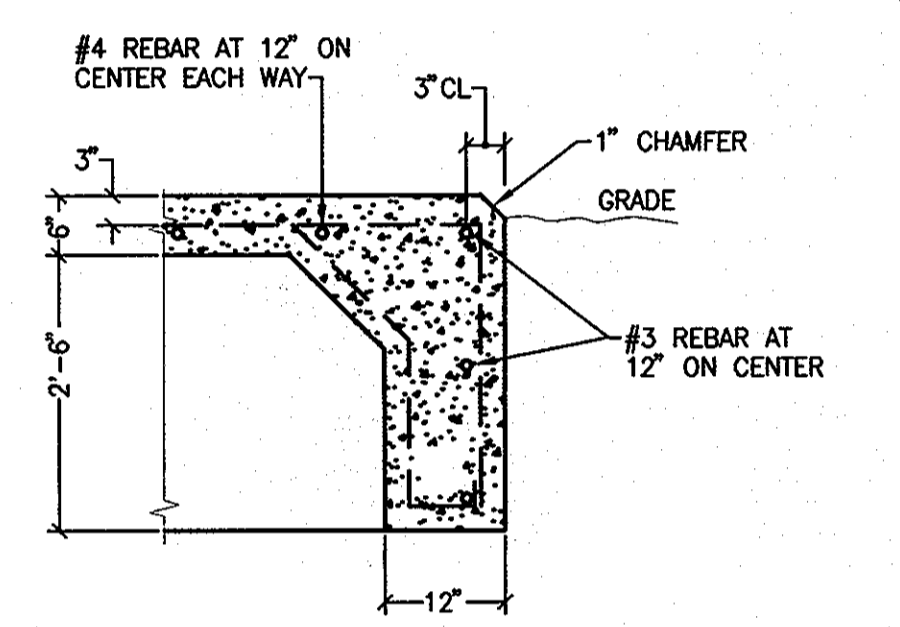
DETAIL - PAD MOUNTED UPRIGHT SUPPORTS
